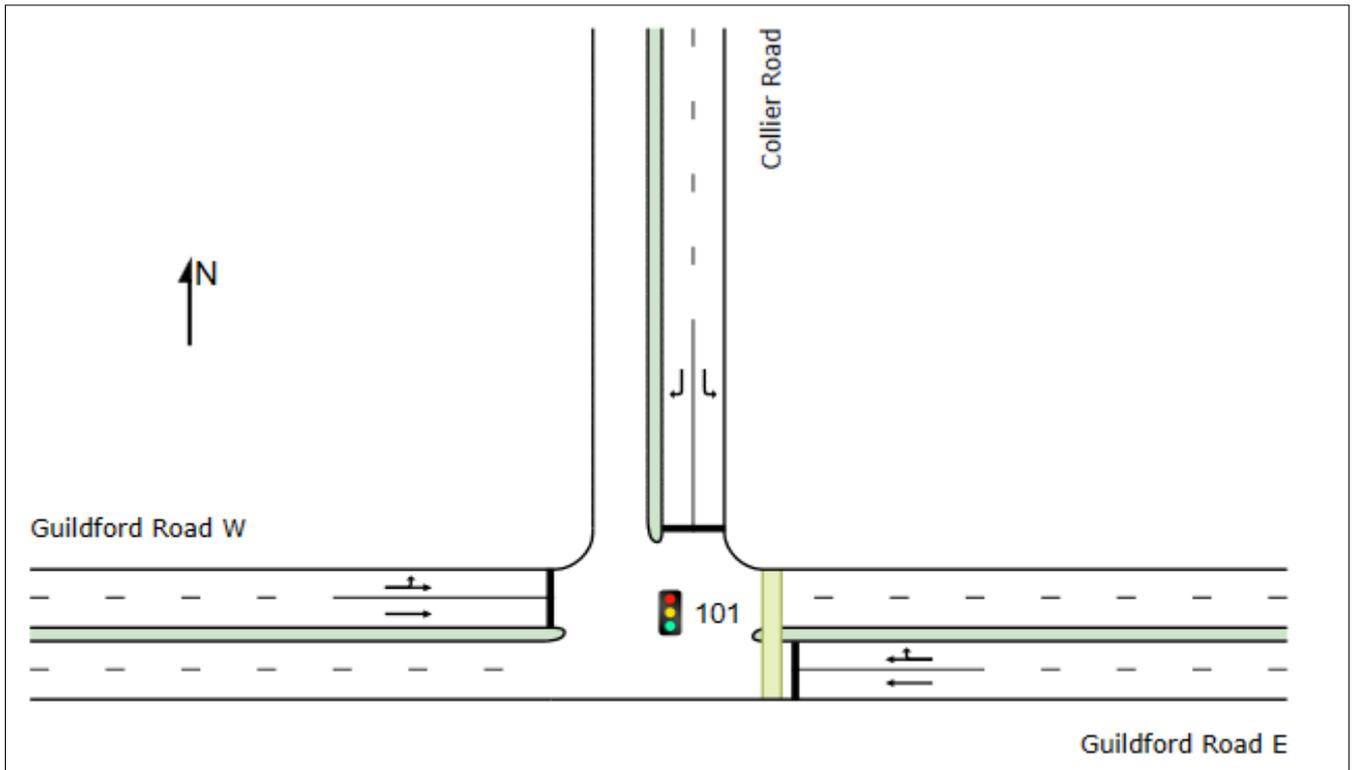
Geometric SIDRA model of Collier Road and Guildford Road intersection
